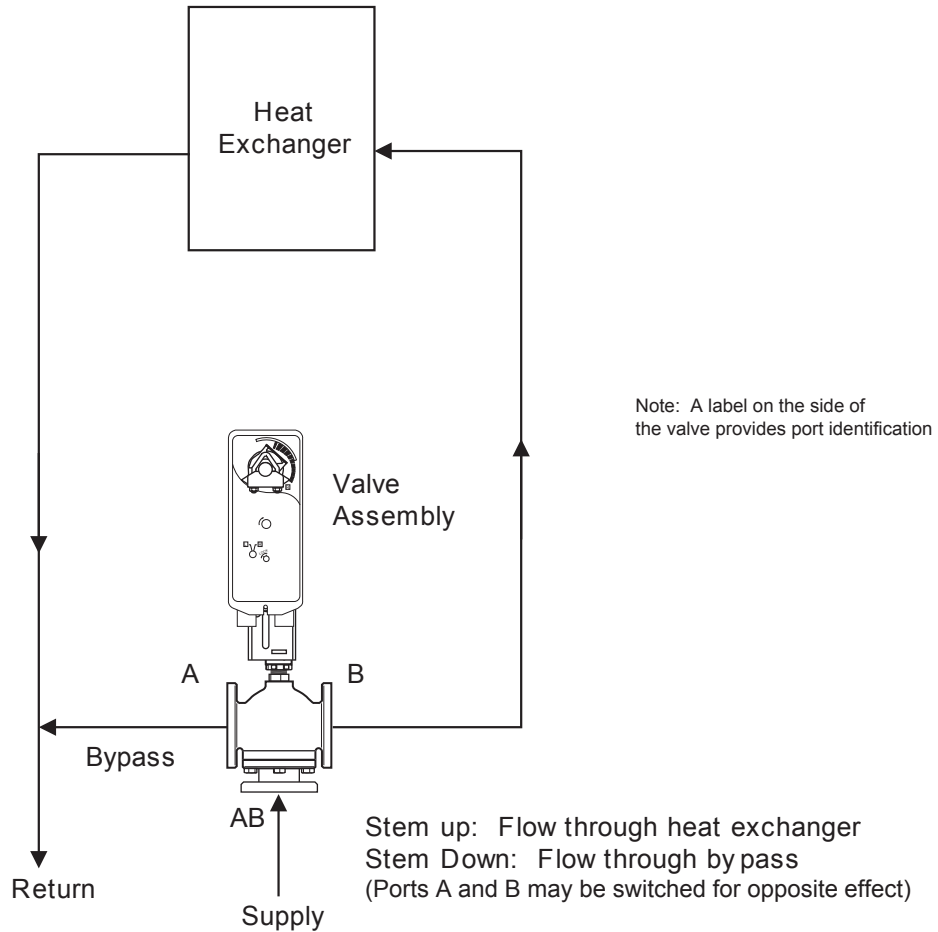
Typical Piping of VB-8303 as 3-Way Diverting Valve
